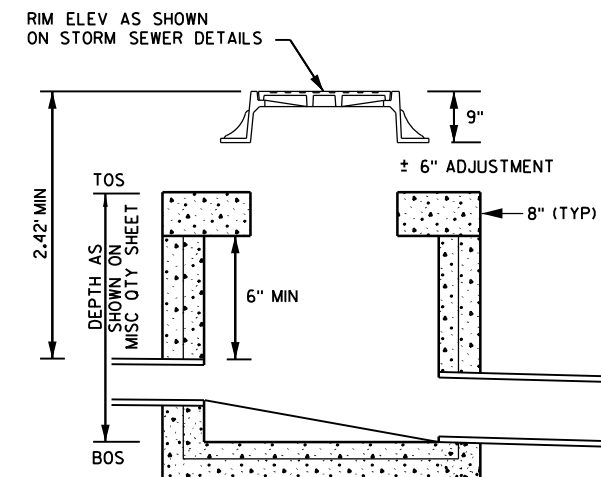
DETAIL FOR COMPUTING CATCH BASIN ELEVATIONS
